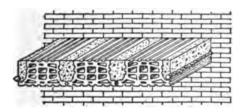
is shown the way floors built of long-span arches are constructed at the outer bays sometimes, to
